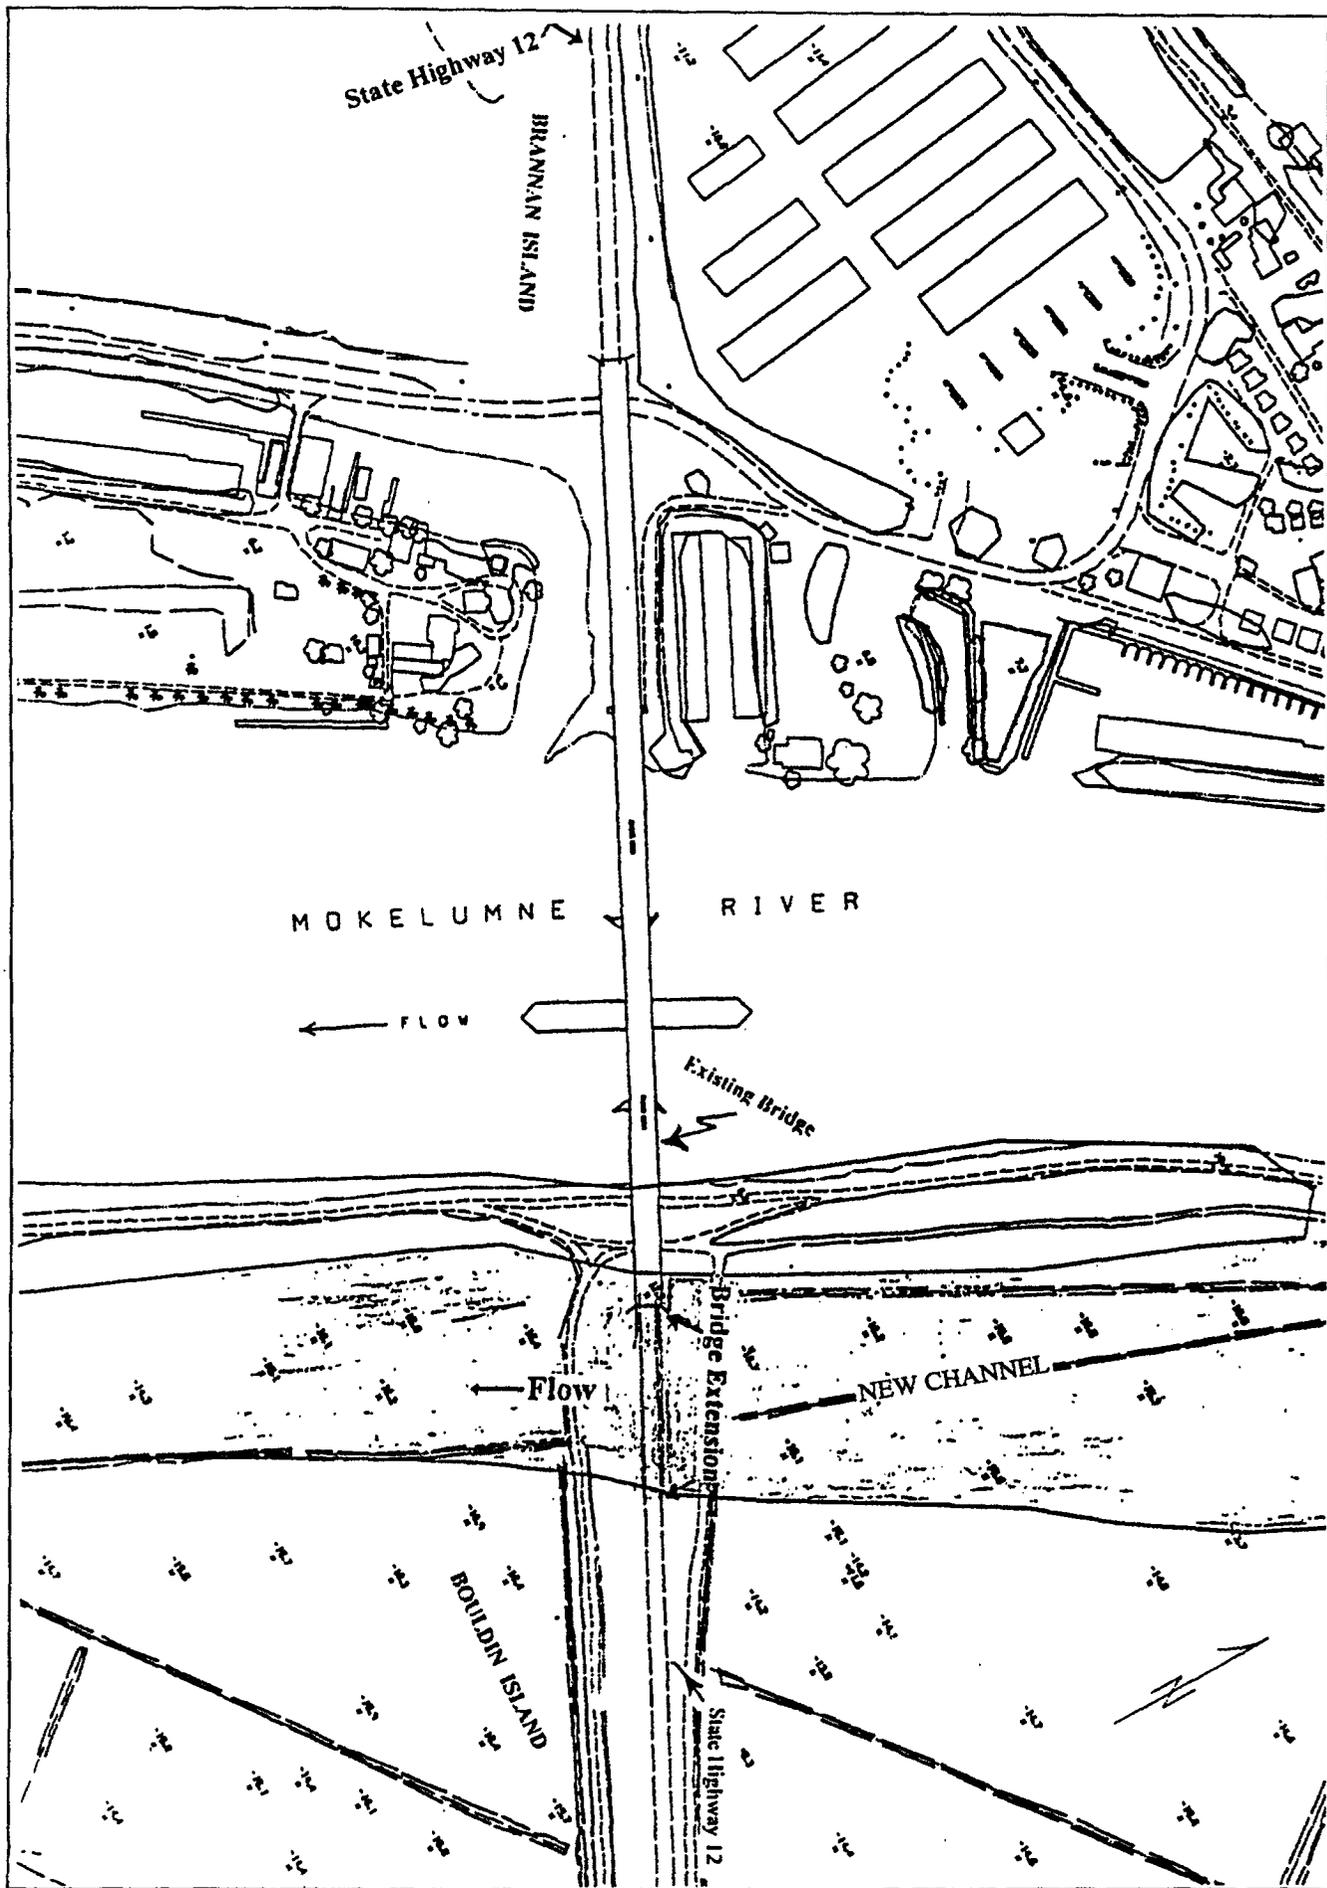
Highway 12 Bridge Extension Over Mokelumne River
